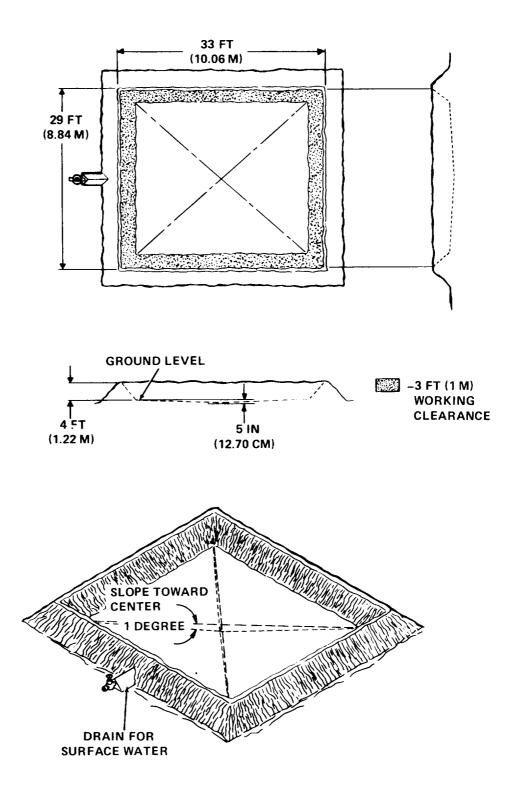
Berm Construction, 20,000 Gallon (75,700 Liter) Tank.
